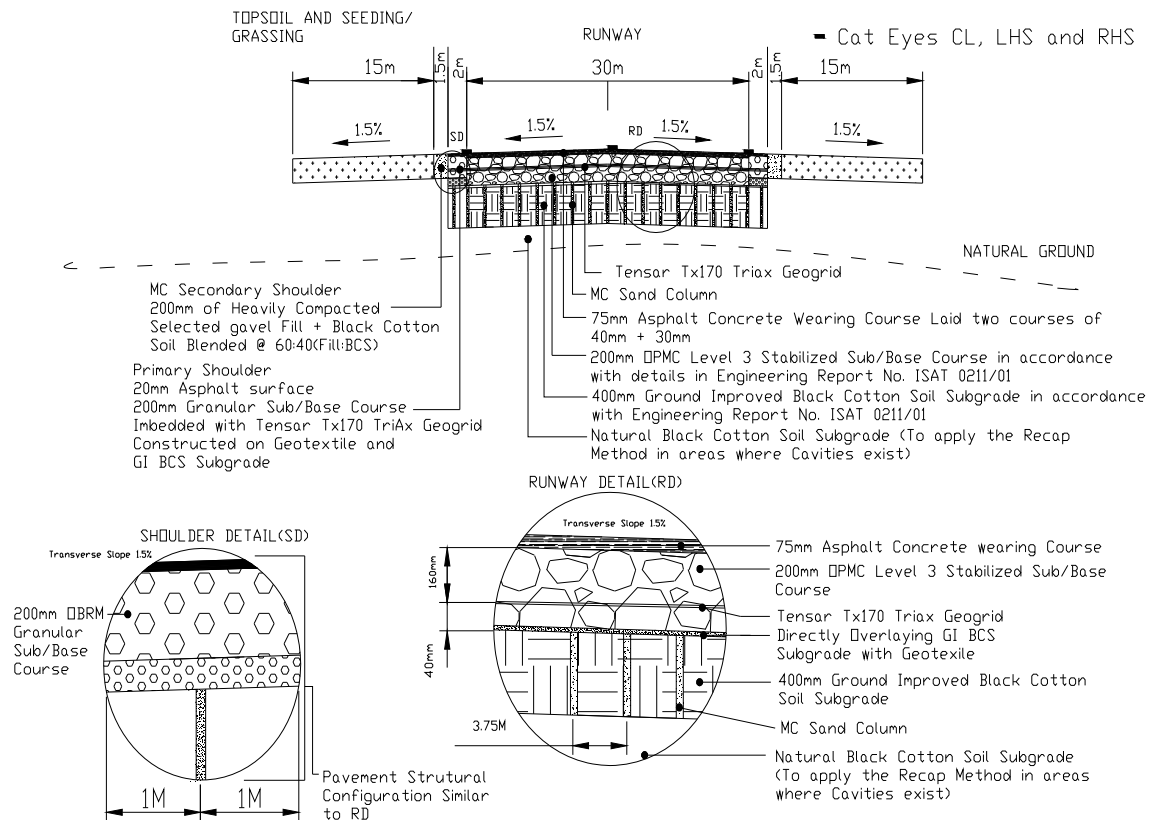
Detail of typical cross-section B and detail of Isiolo International Airport pavement structure
